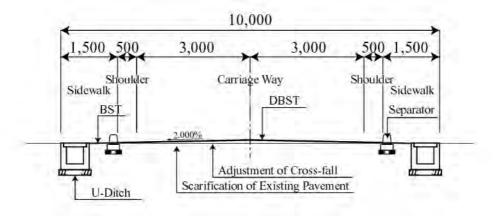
Standard Cross-Section: Taatirerei Road in Betio (2)
